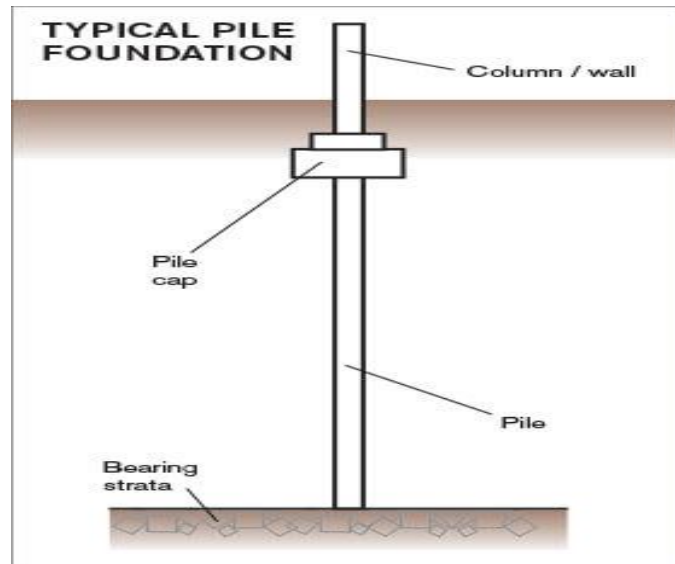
Typical Pile Foundation (Bowels, 1996)
